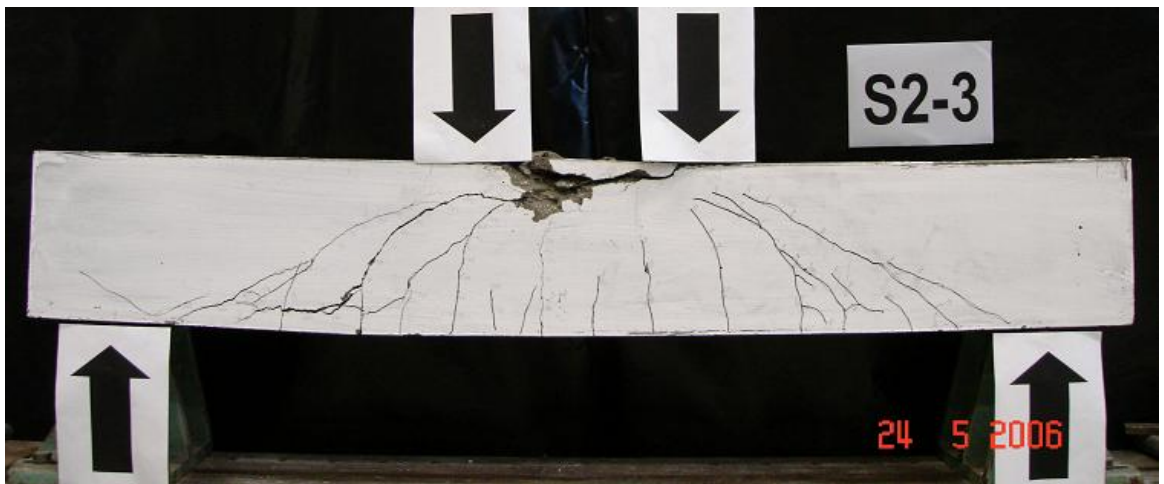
Overall Crack Pattern for Beam S2-3 (Back Face)
